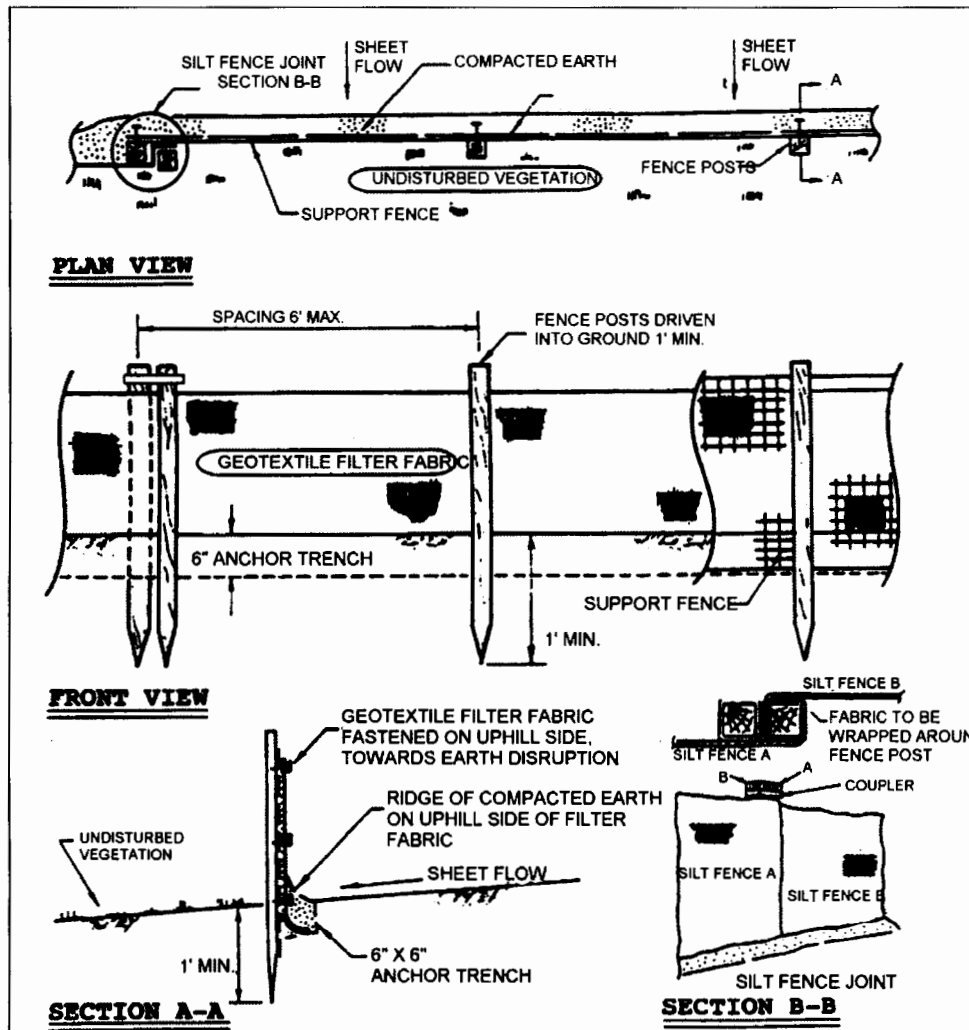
Typical Silt Fence Construction (Nebraska H2O n.d.)
